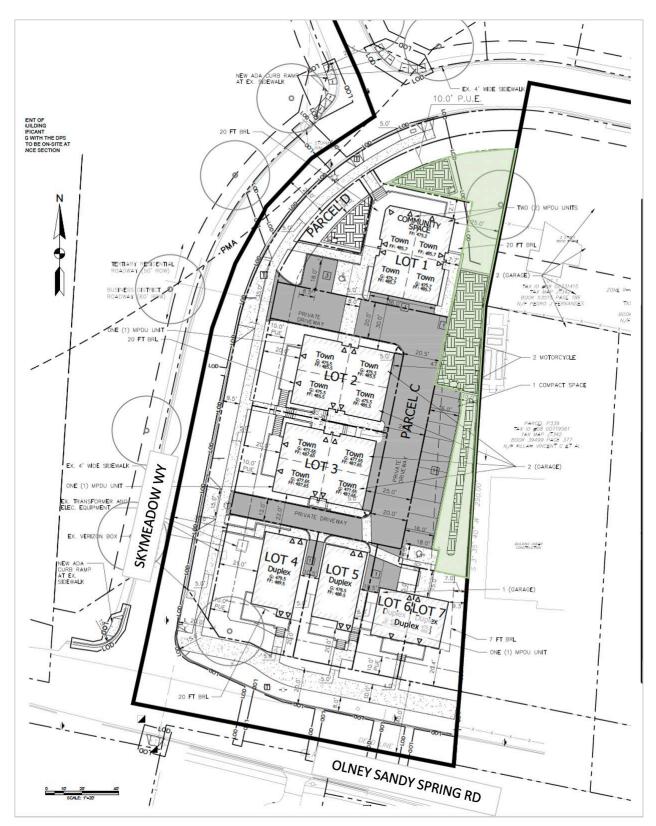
Proposed Site Plan (southern portion) with 12 new townhouses and three (3) new duplex housing units
